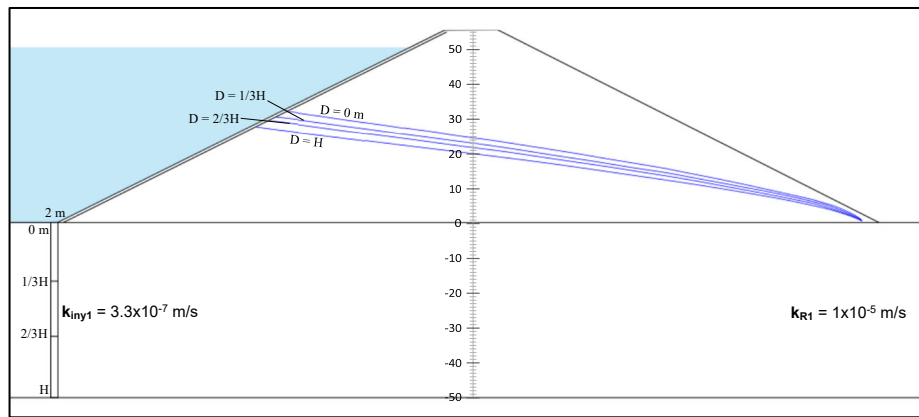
1-line grout curtain Piezometric profile within the dam wall – $S_2 = 50$ m stratum.
